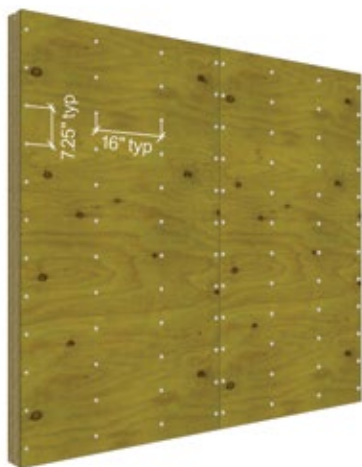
Sheathing nailing pattern for nail laminated 2 × 8 wall design.
